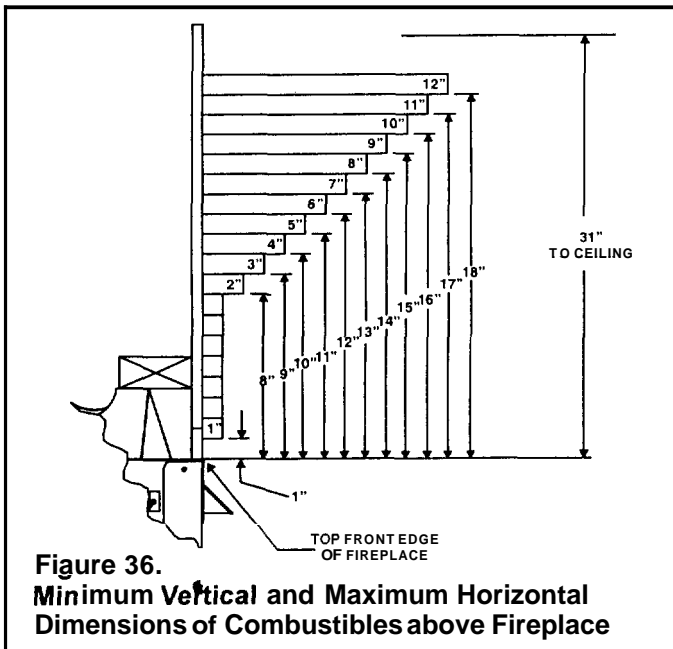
Minimum Vertical and Maximum Horizontal Dimensions of Combustibles above Fireplace
